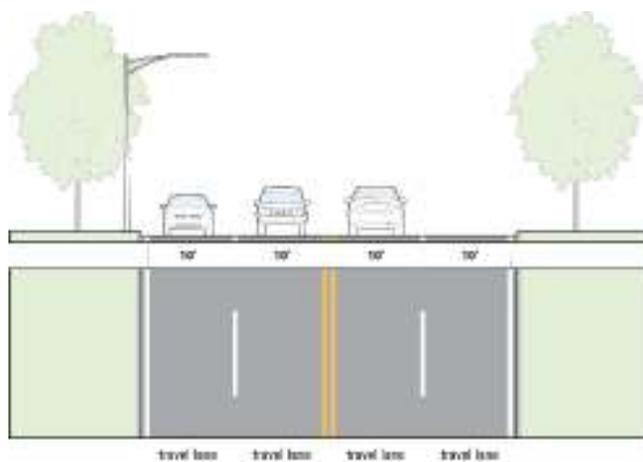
Hammond Pond Parkway Segment 1A Existing Typical Cross Section
